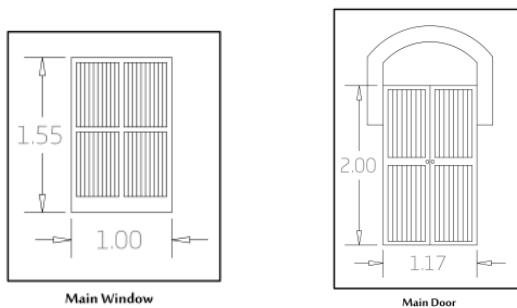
Elevation of Al-Jilani Zawiya Door and Window Design. (Source: Author, 2024)
